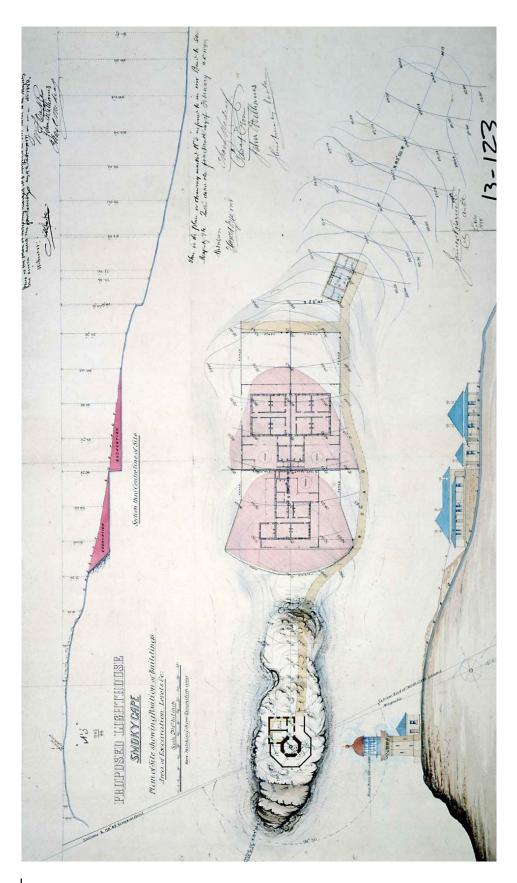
Site plan for Smoky Cape Lightstation (James Barnet, 1889)
